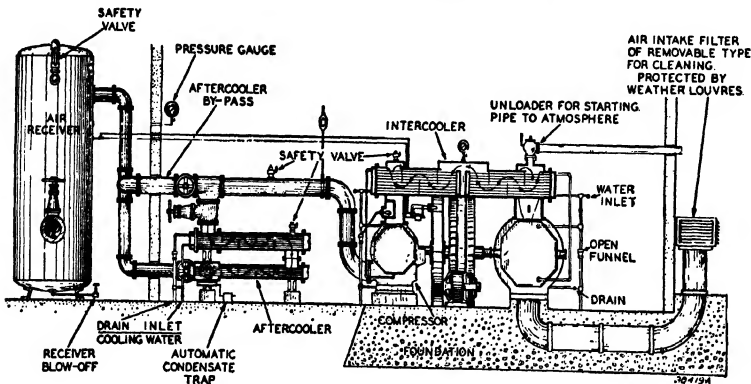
Compressed air plant. (Courtesy Ingersoll Rand Co.)
